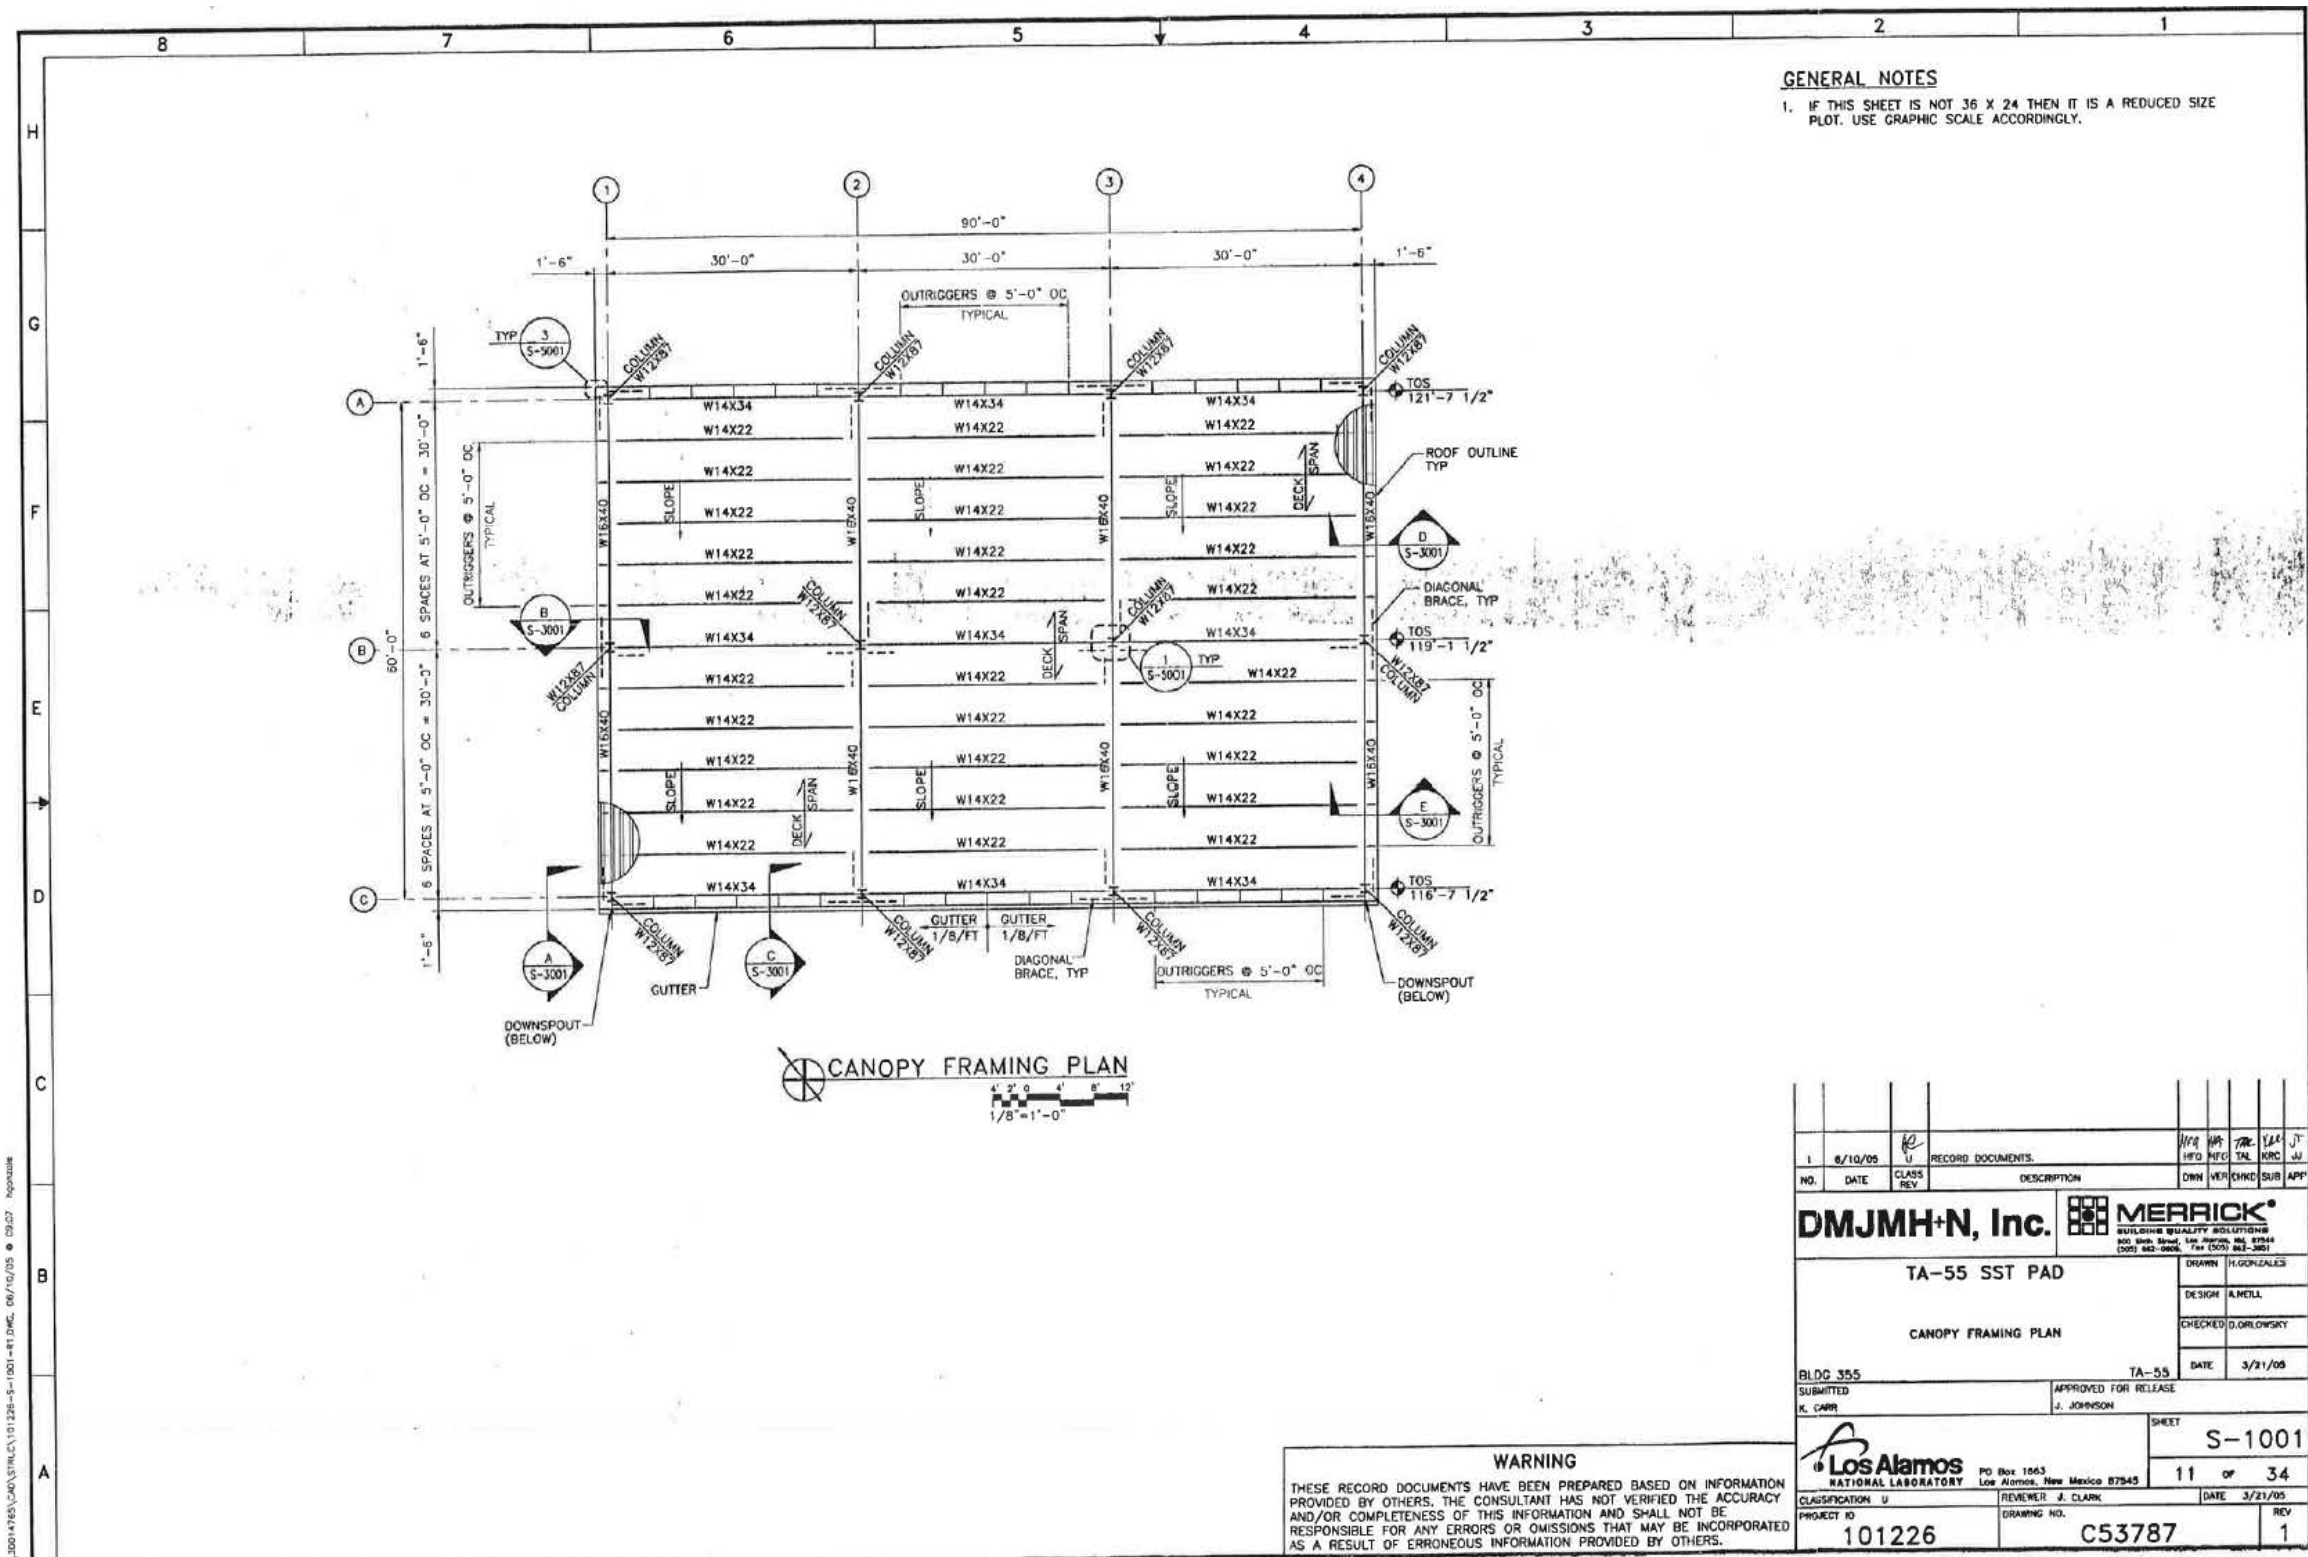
TA-55-0355 Design Drawing (Canopy Framing Plan)
